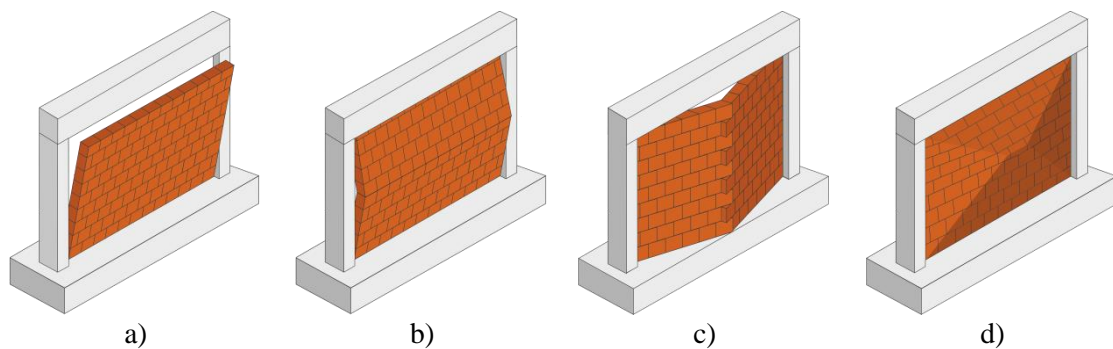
Out-of-plane failure modes of infill walls (Kubalski et al., 2017)
